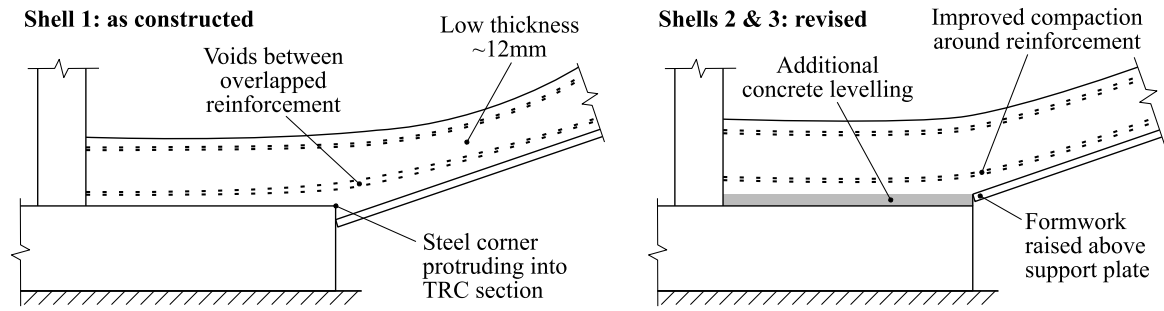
Construction defects leading to premature failure at corner C for Shell 1 (left), and the subsequent improvements made to the formwork positioning and manufacturing method for shells 2 and 3 (right).
